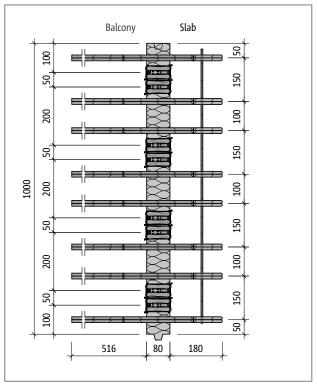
Schöck Isokorb® T type Q-E-W-VV5: Product layout
